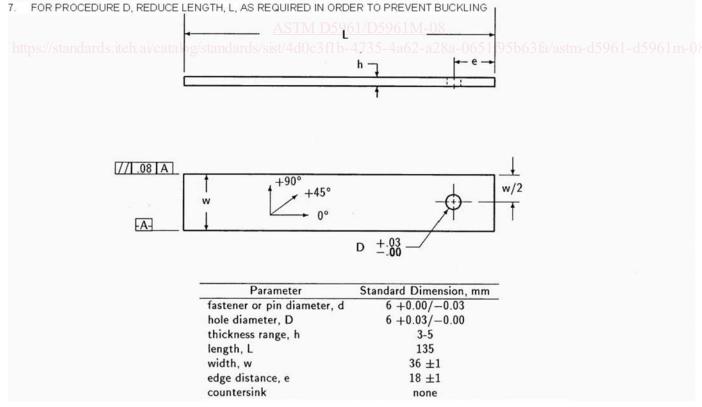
Double-Shear and Single-Shear One-Piece Test Specimen Drawing (SI)
